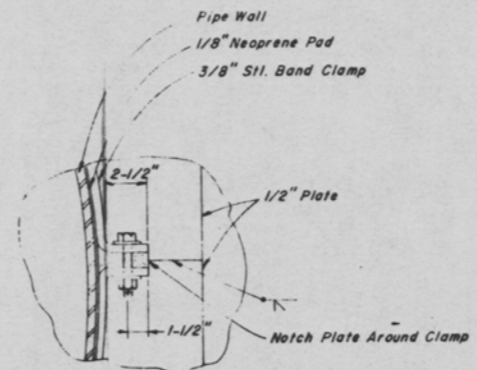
" TO 66" DIAMETER PIPE THRU STEEL SHEET PILING (1)
